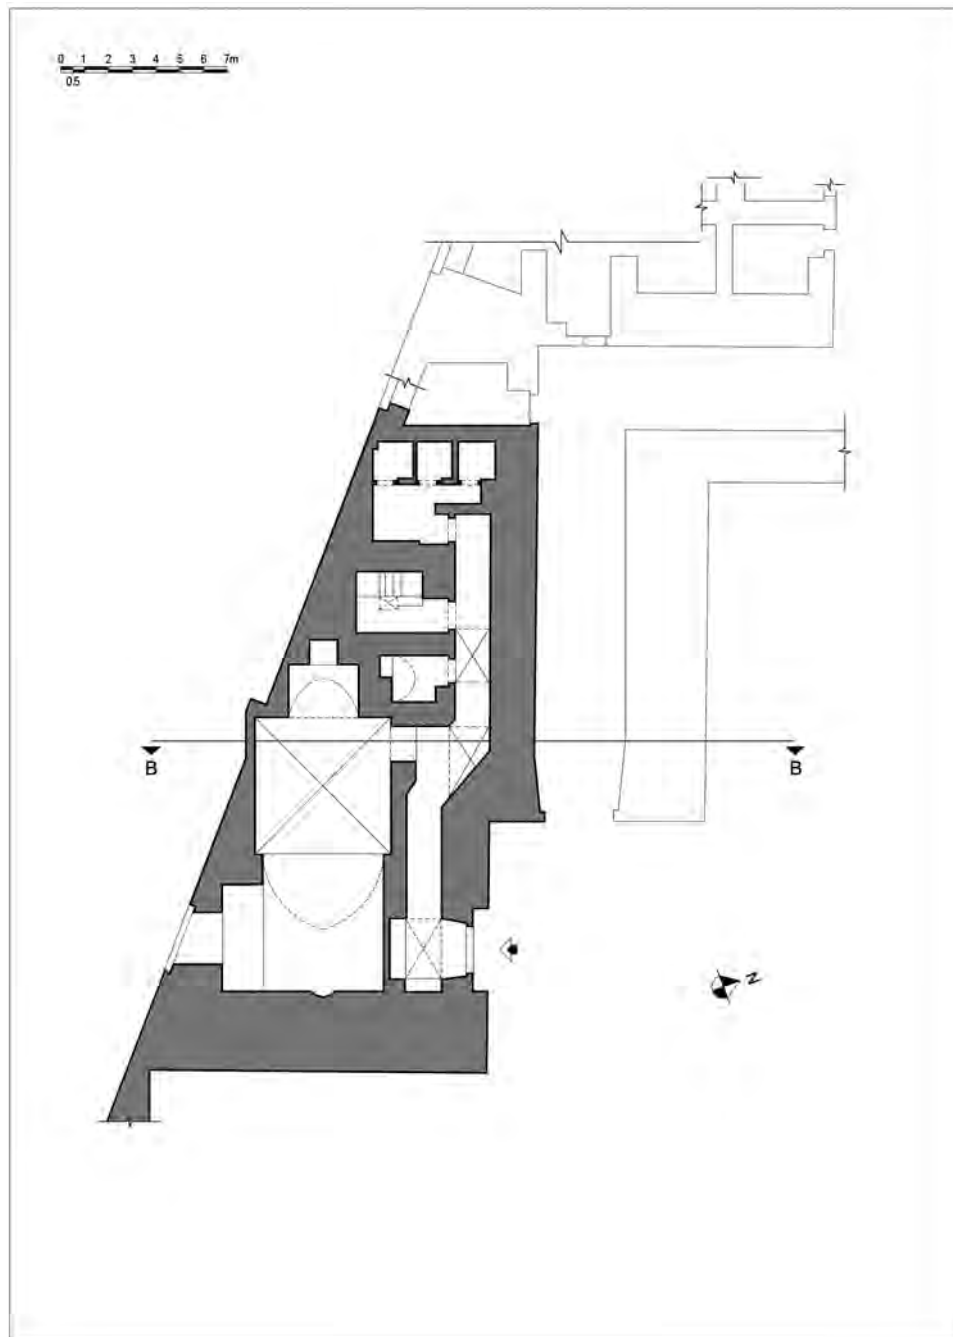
Ḥanbaliyah Madrasah, Complex of Sultan Ḥasan, ground floor plan (H. Al-Harithy)
